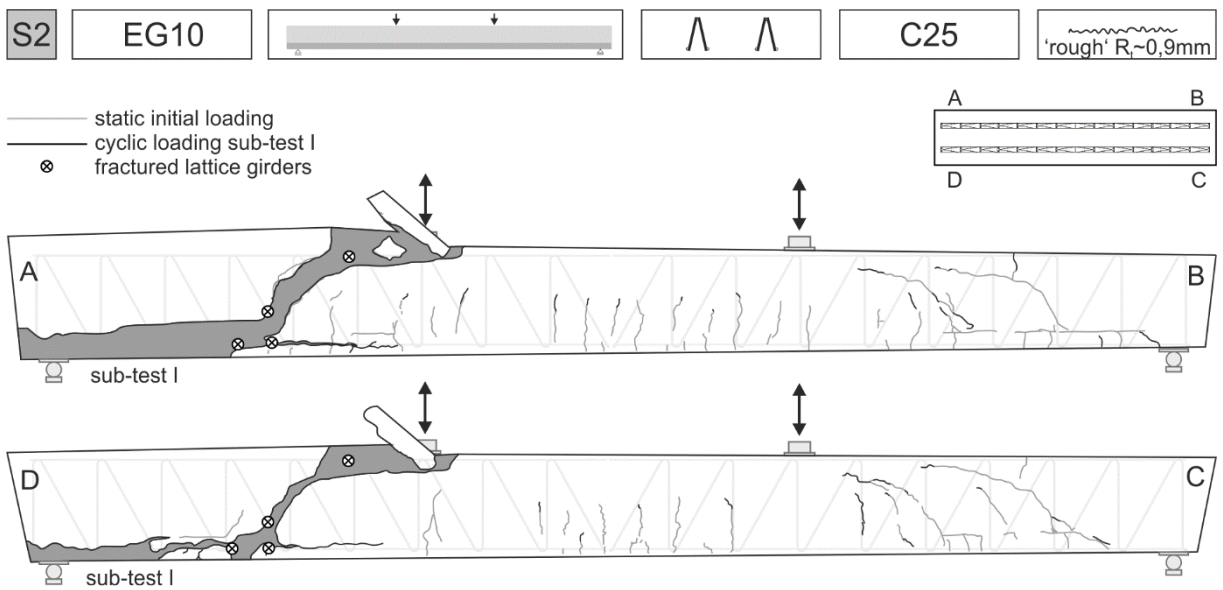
Test parameters, crack patterns and lattice girder fractures of specimen EG10
